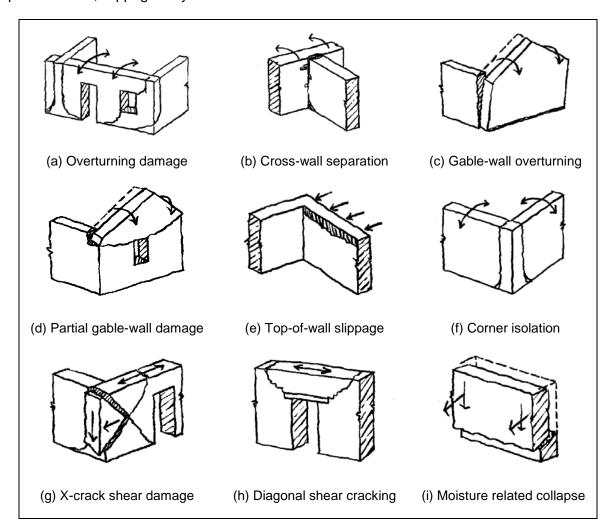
Typical out-of-plane and in-plane wall damage
